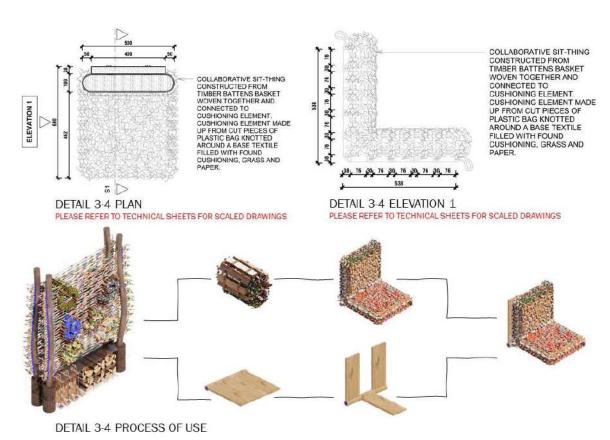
Technical drawings of detail 3.4 as specified (Author, 2021).
